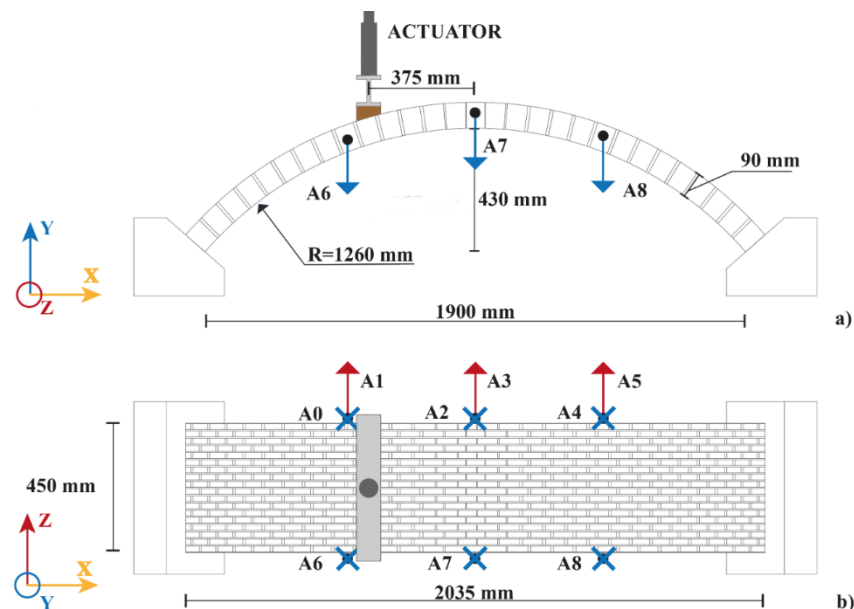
Geometric dimensions of the adobe arches and test layout with sensors location: a) Front view; b) Top view
